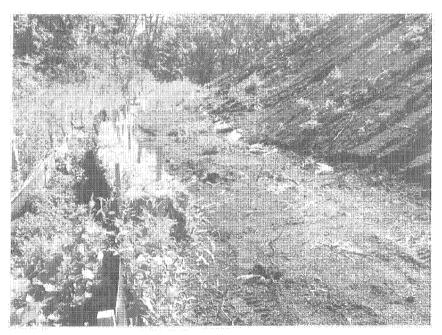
D9 Staging Area – East Site Exclusion Zone for the Potentially Impacted Material Stockpiles (PIM-1 and PIM-2).
